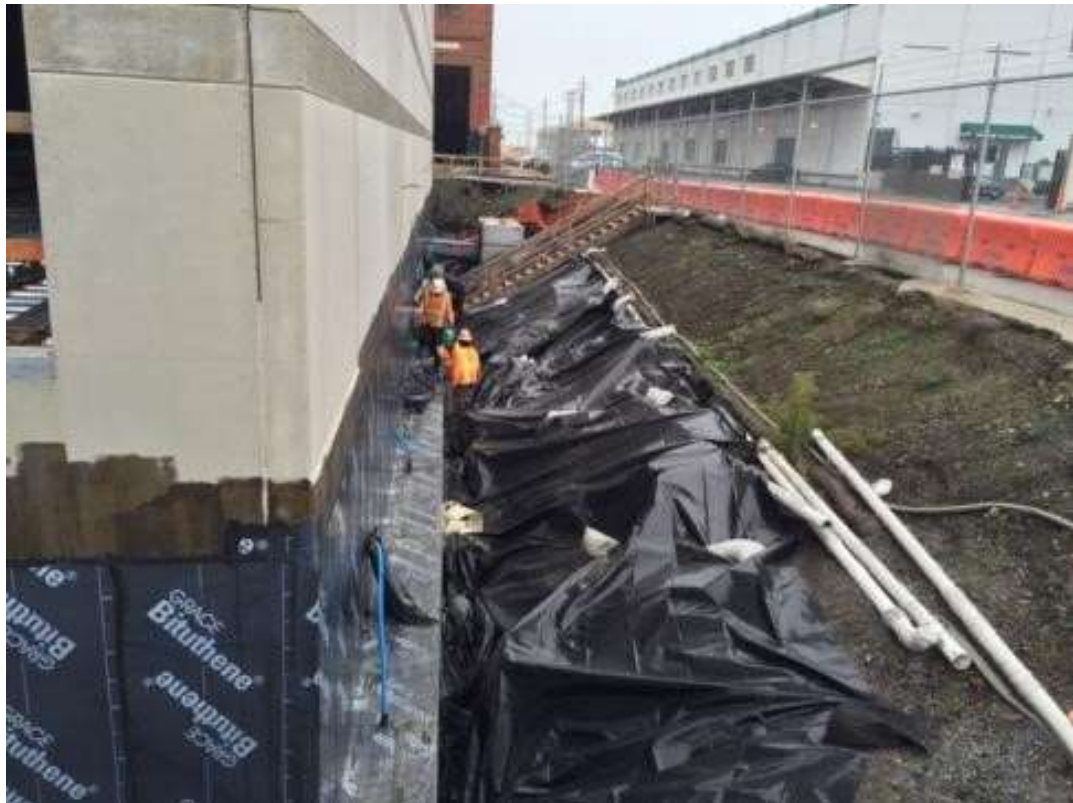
ERS exposed waterproofing in preparation for reinstallation on the GIS building. View east, January 20, 2016. Photo courtesy of PG&E.
